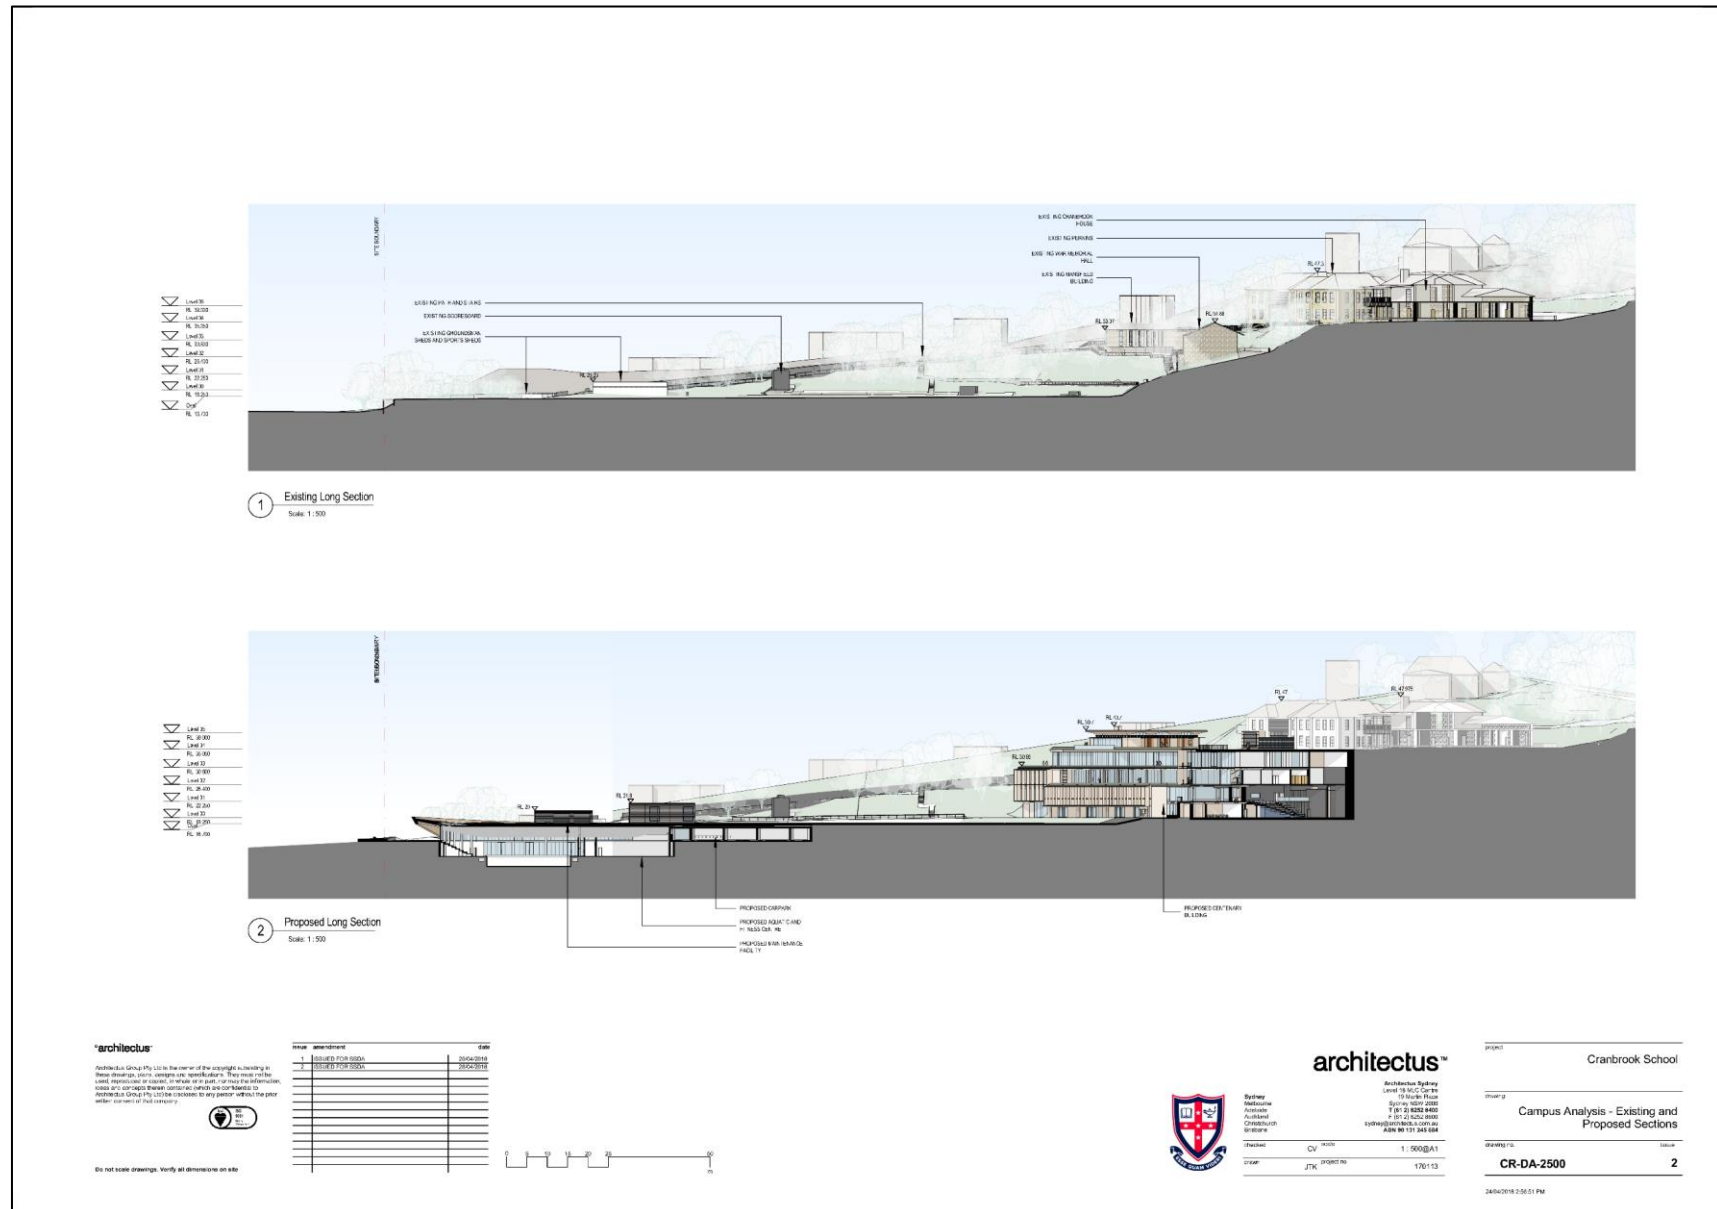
Showing existing and proposed elevation sections for Cranbrook (plan courtesy of architectus).
